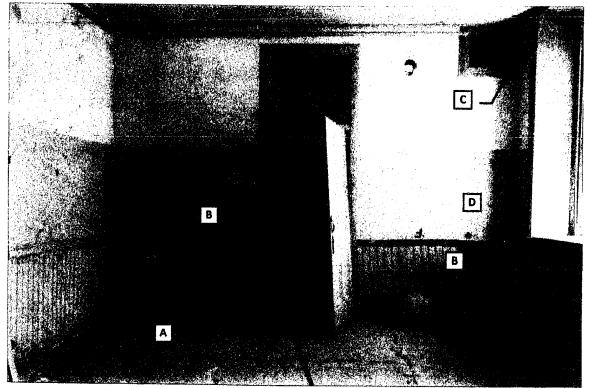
Girls' Bathroom view east. (A) Disintegrating concrete, (B) Historic porcelain sink, (C) Upper fresh air gravity vent intersecting south wall vent, (D) Wall is buckling inward. 36
